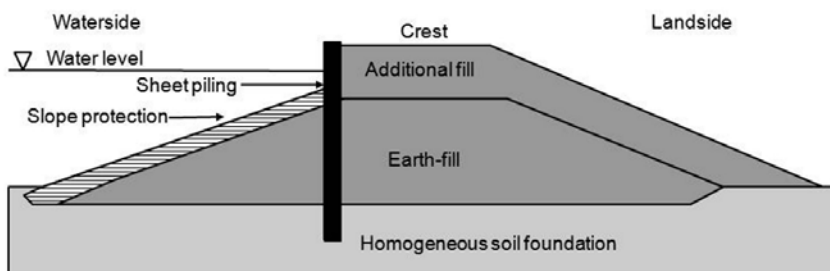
I-type flood wall on crest of levee on homogeneous soil foundation
